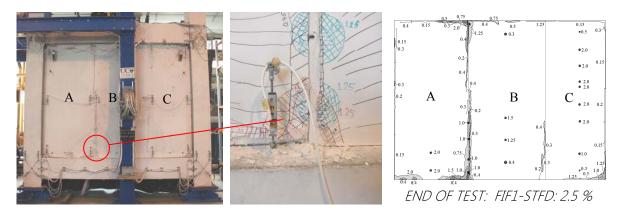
Damage state of steel framed drywall FIF1-STFD at the end of test
